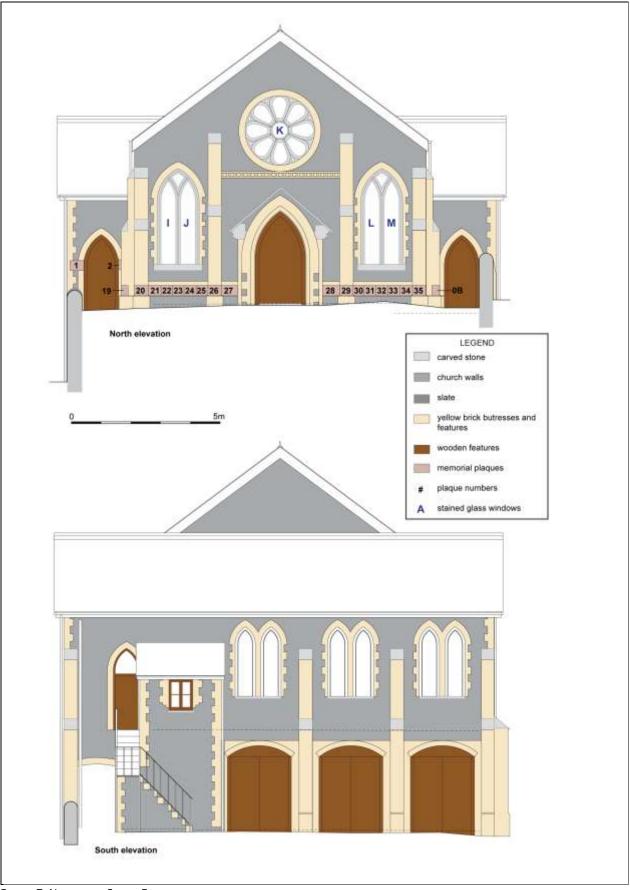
NORTH AND SOUTH ELEVATIONS.
